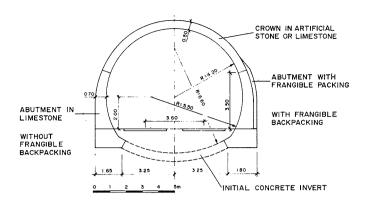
Initial Tunnel cross-section with invert arch, dating from 1912-1916, in Anhydritic shale (km. 6.2)
